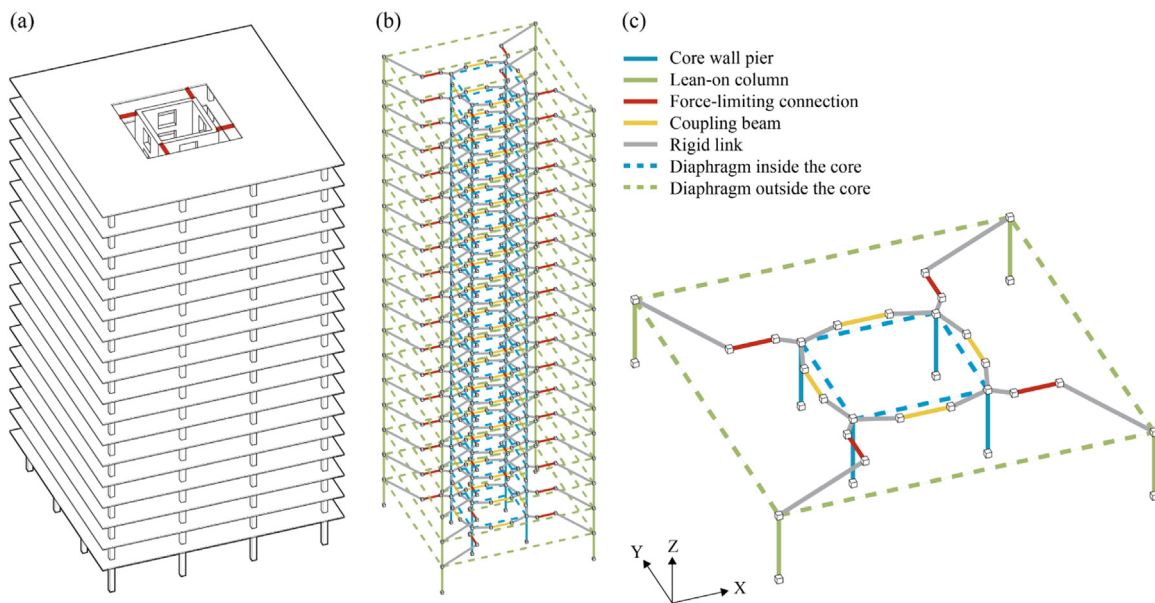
Schematic representation of (a) the eighteen-story core wall building with the Modified FDs, (b) the numerical model of the eighteen-story core wall building and (c) a typical floor simulated in the numerical model of the building.
